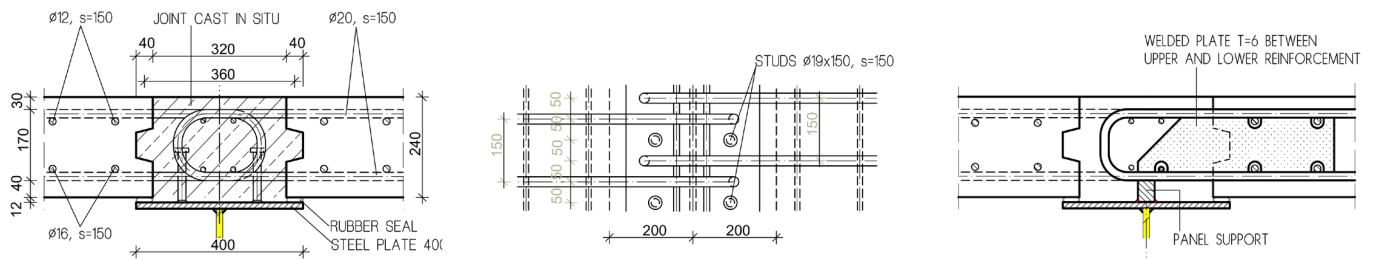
In-situ concrete joint to connect the precast concrete panels and the steel work. ©Schlaich bergemann partner
